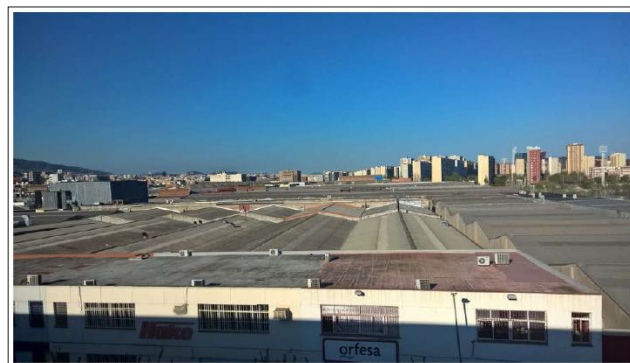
Industrial Building Roofs in Bellvitge, in Hospitalet de Llobregat, Spain, where We Can See a lot Corrugated Fiber Cement Roofs Built in the 1970s (author's Photograph)
